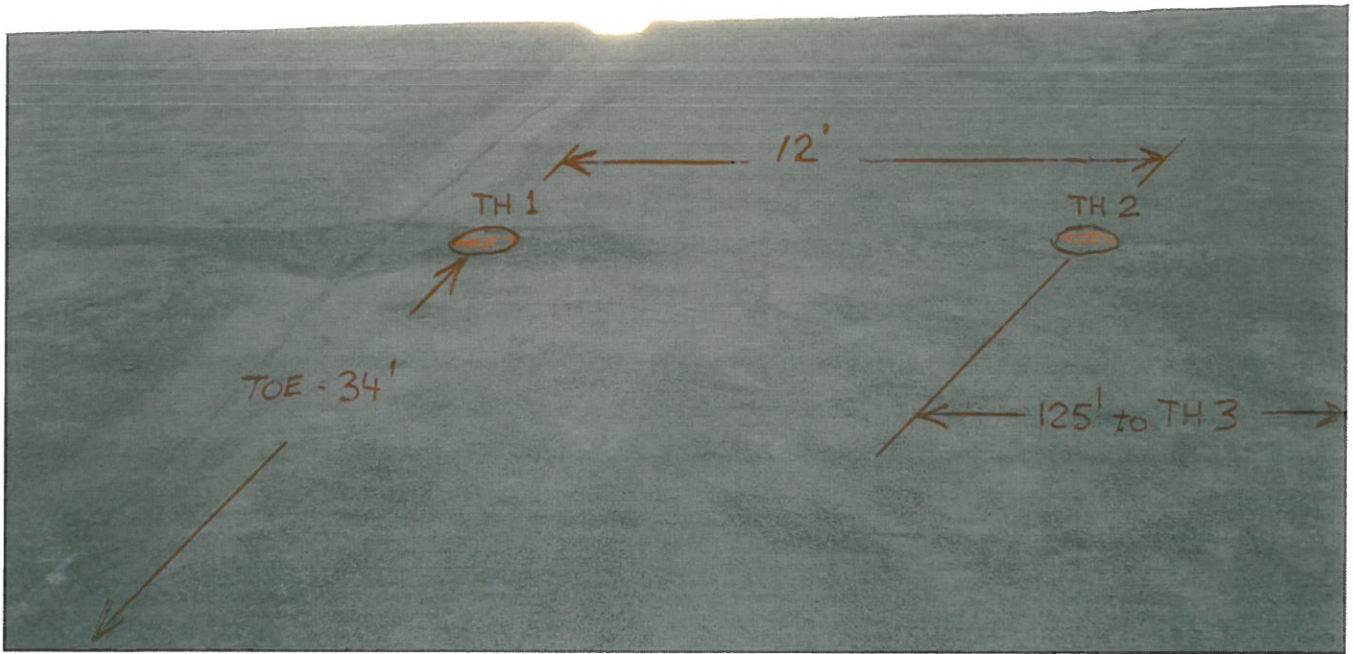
West pond slope, Test Holes 1 and 2, dimensions.
